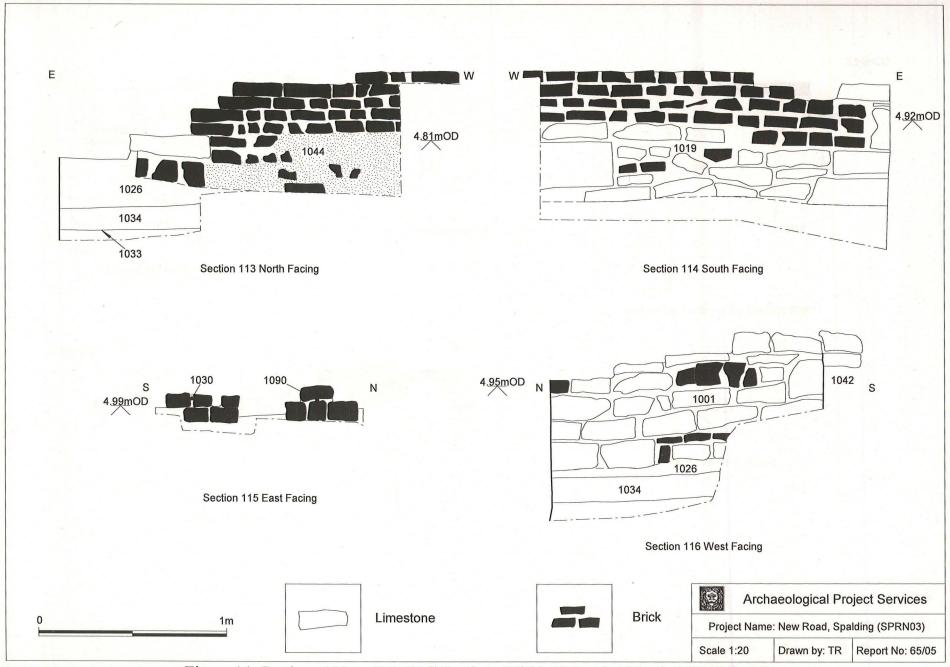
Sections 113 to 116, Wall Sections Within Extension North Of Building 1
